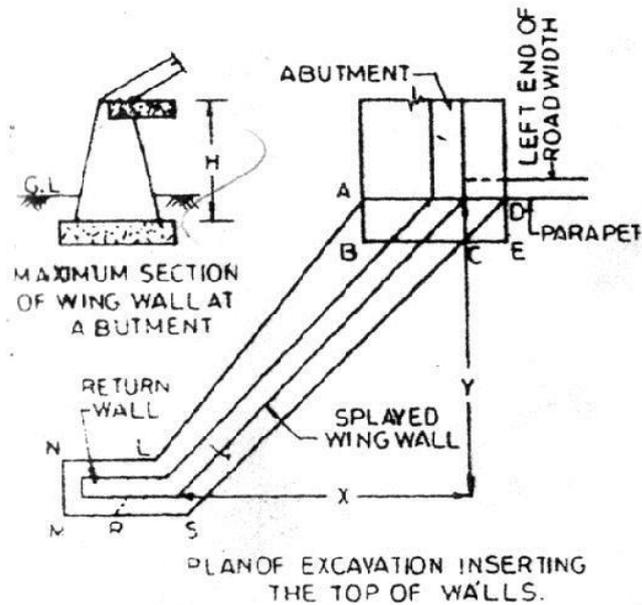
(Plan showing abutment, wing wall and return wall)
